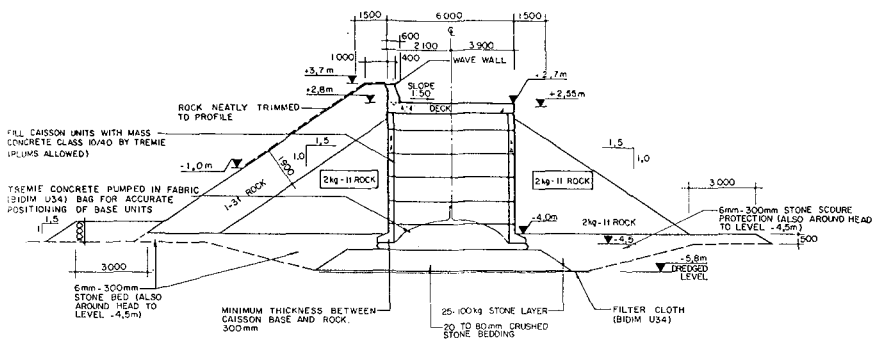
CROSS SECTION THROUGH SECONDARY BREAKWATER CAISSON END
